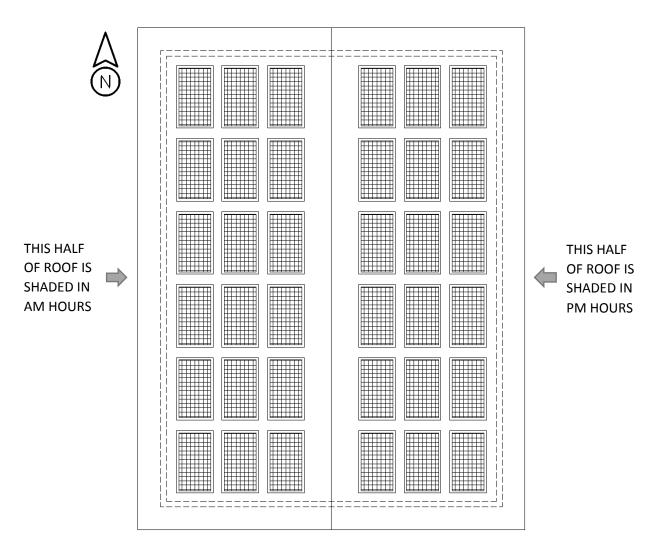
36-Panel East-West-Facing Solar Panel Layout, 40-Foot x 30-Foot Rambler
